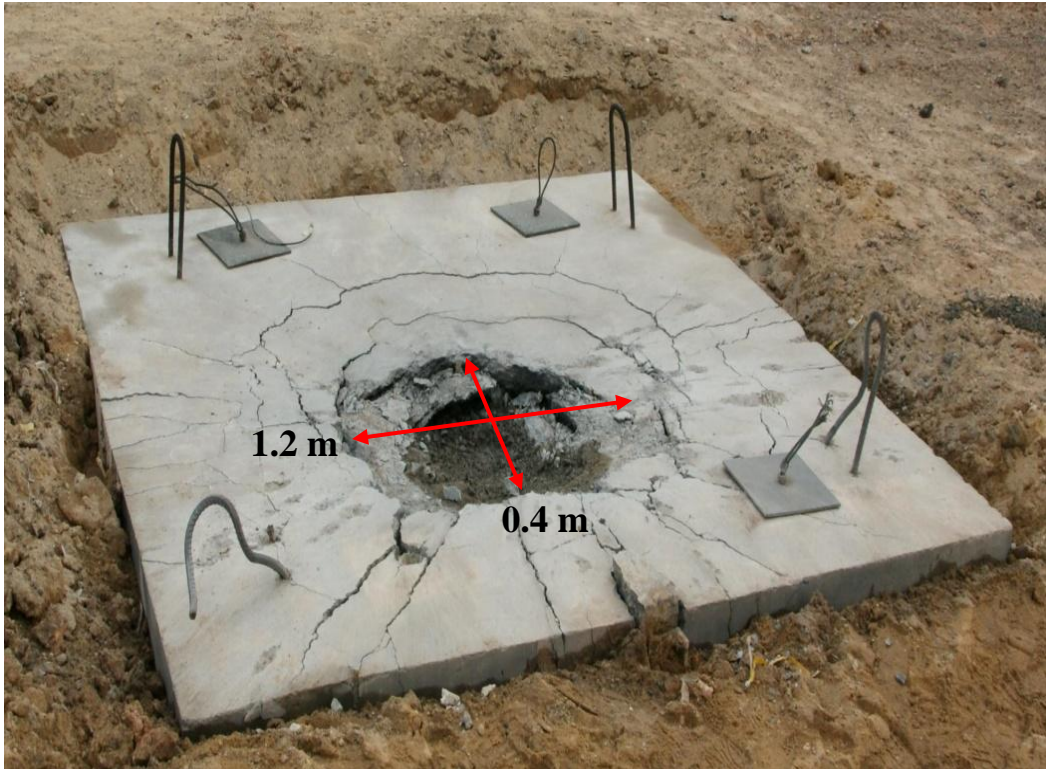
Damage pattern in field test for concrete slab
